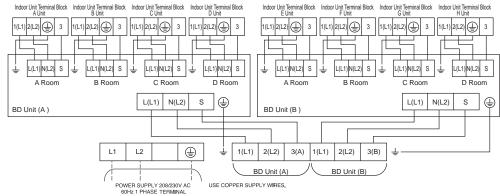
Detailed View of Outdoor Unit Terminal Blocks / Connections.
